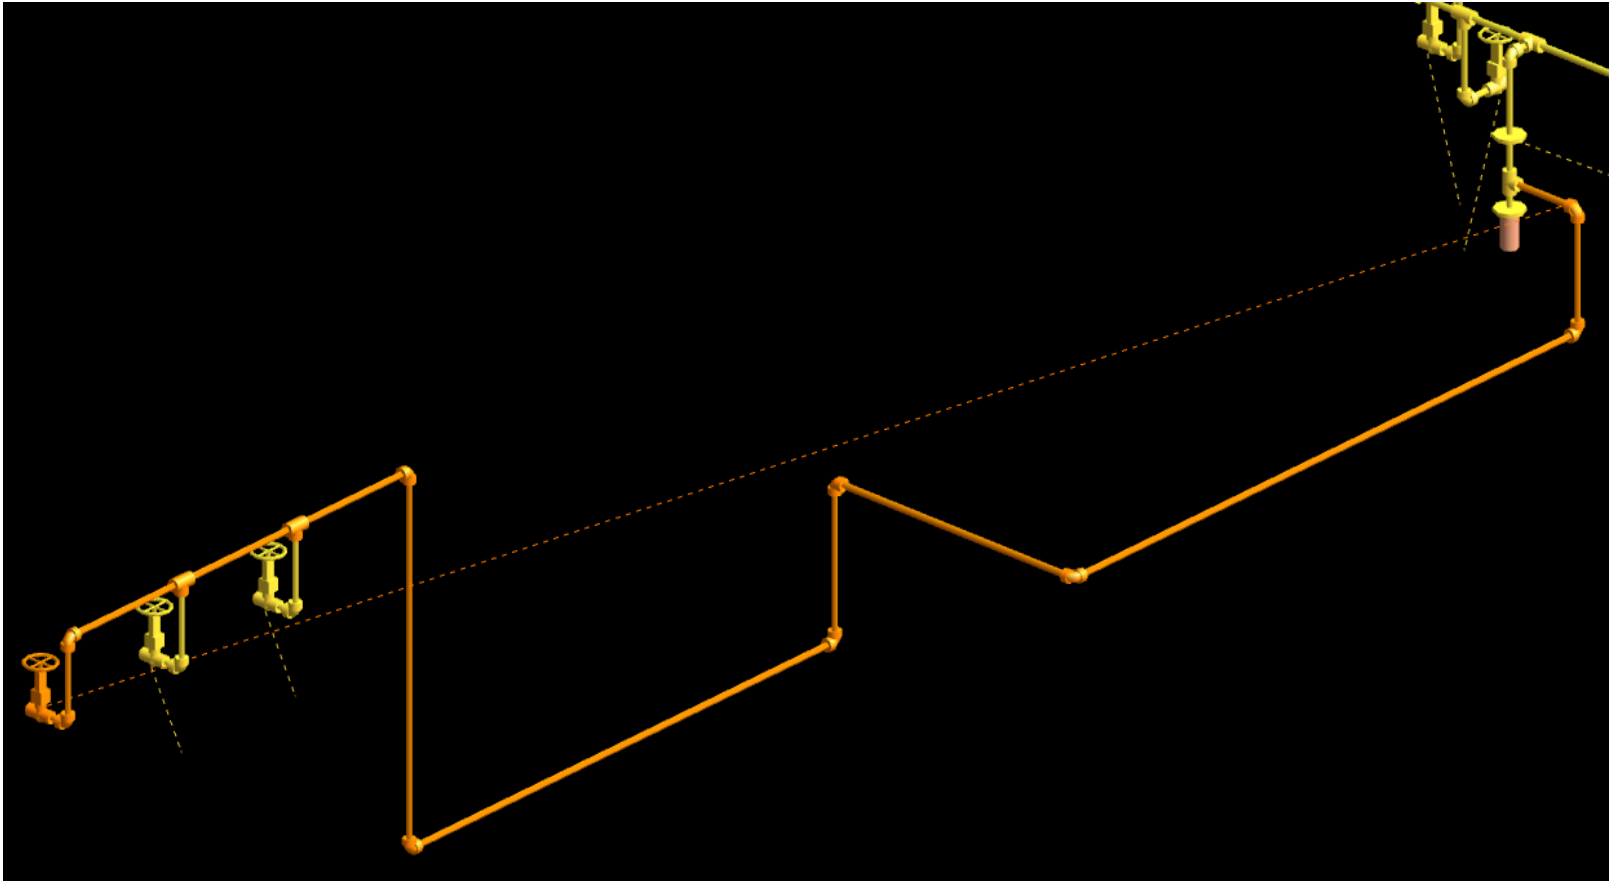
Tubing layout at PERKASA Building (3D review)
